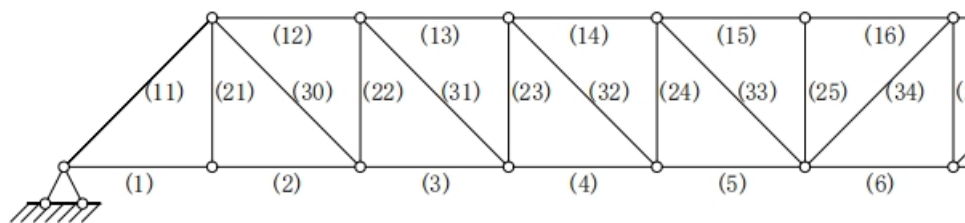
Part of the Pratt Truss Bridge Scheme 3 model
